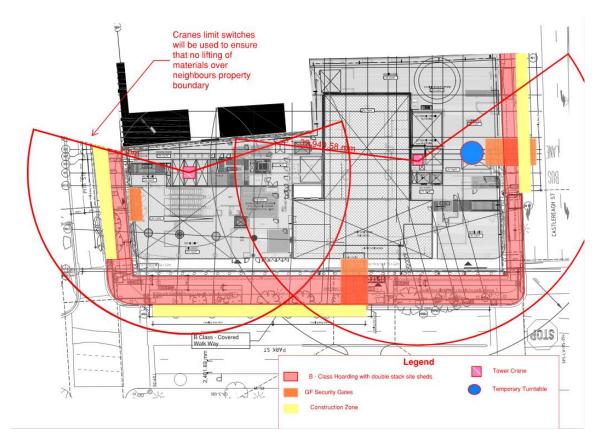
North Tower - Internal Tower Crane Located in Lift Shaft (Stage 1)
